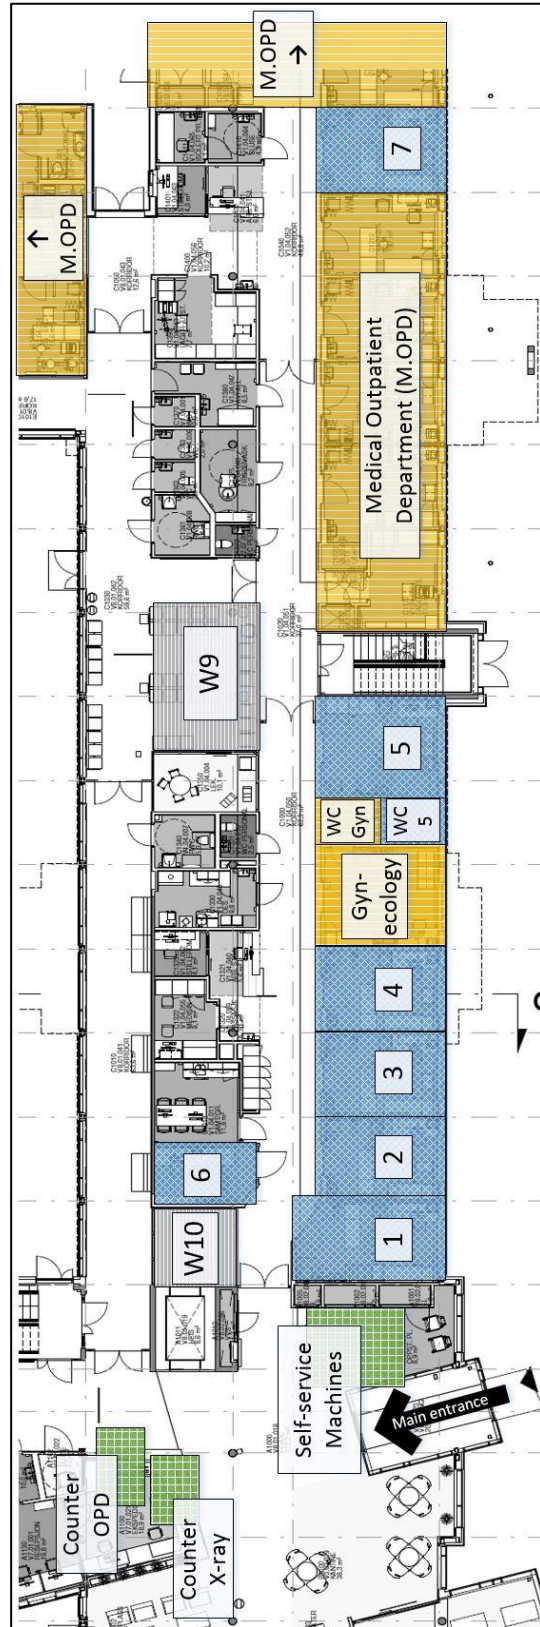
Floor plan over Outpatient Department 3 and surrounding areas.
